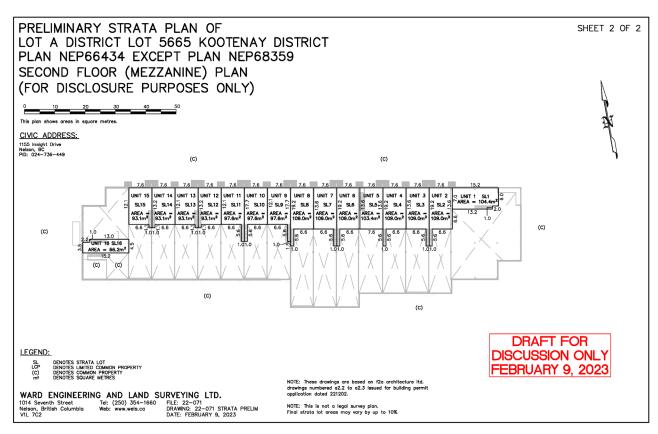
Proposed Strata Plan (second floor mezzanine plan)
